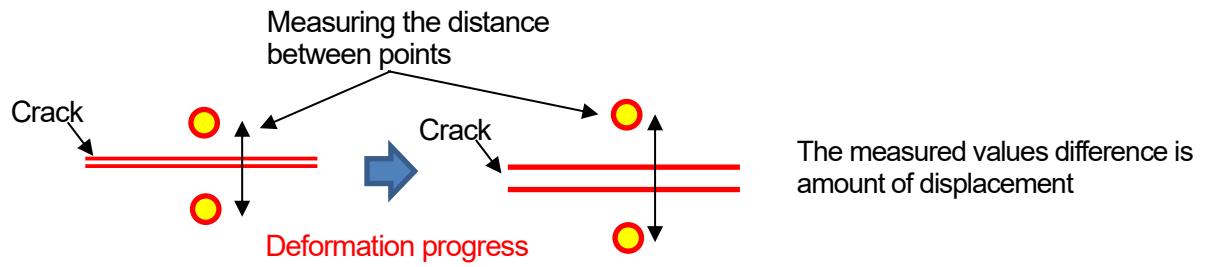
Crack monitoring (Measuring markings or rivets)
